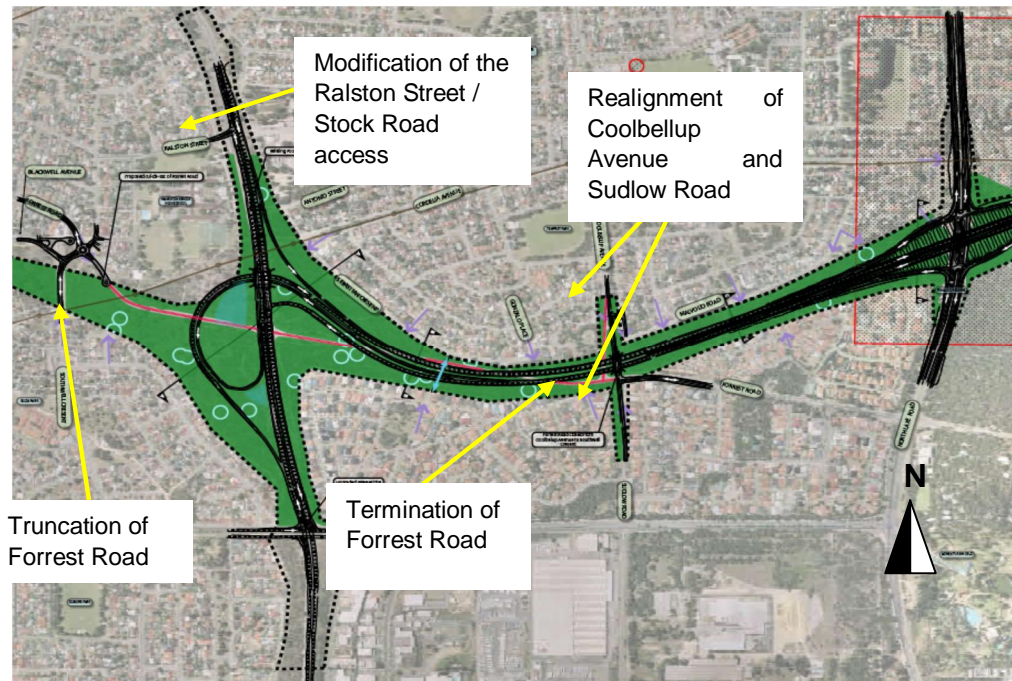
Roe Highway Extension Design Discussion Drawing, Western Section
